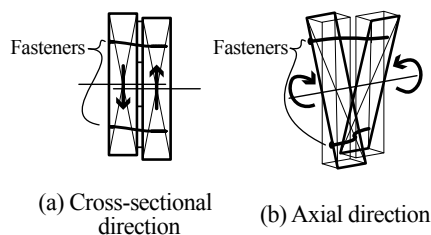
Transfer mechanism of shear force of coupling joint in frame
